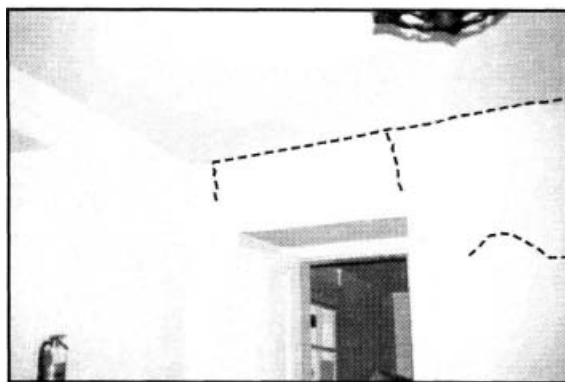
Centinela Adobe. Minor damage to the adobe wall over the doorway (dotted line along crack).
